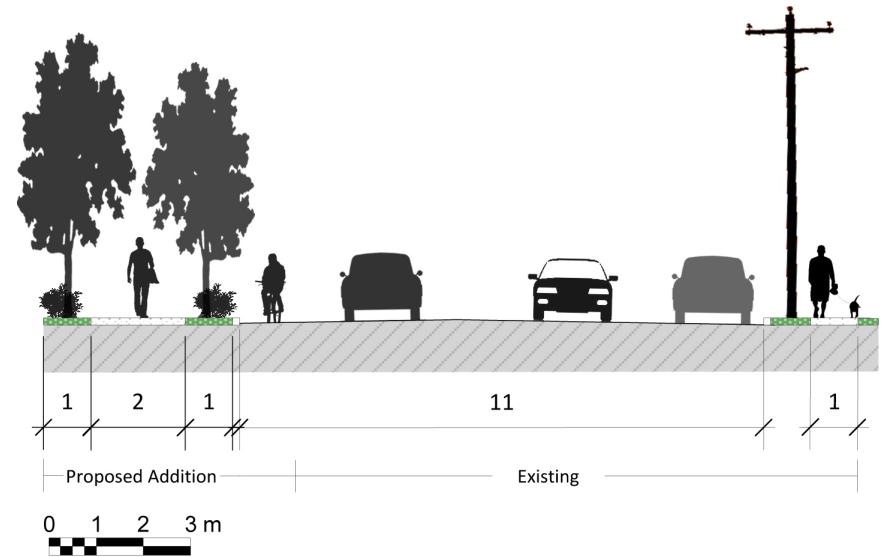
Trail Enhancement Section Facing North (for trails marked B & B1 on Figure 5.2.1)
